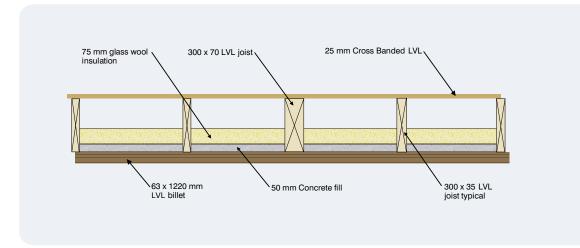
Cross-section of LVL floor cassette with concrete and insulation fill.
